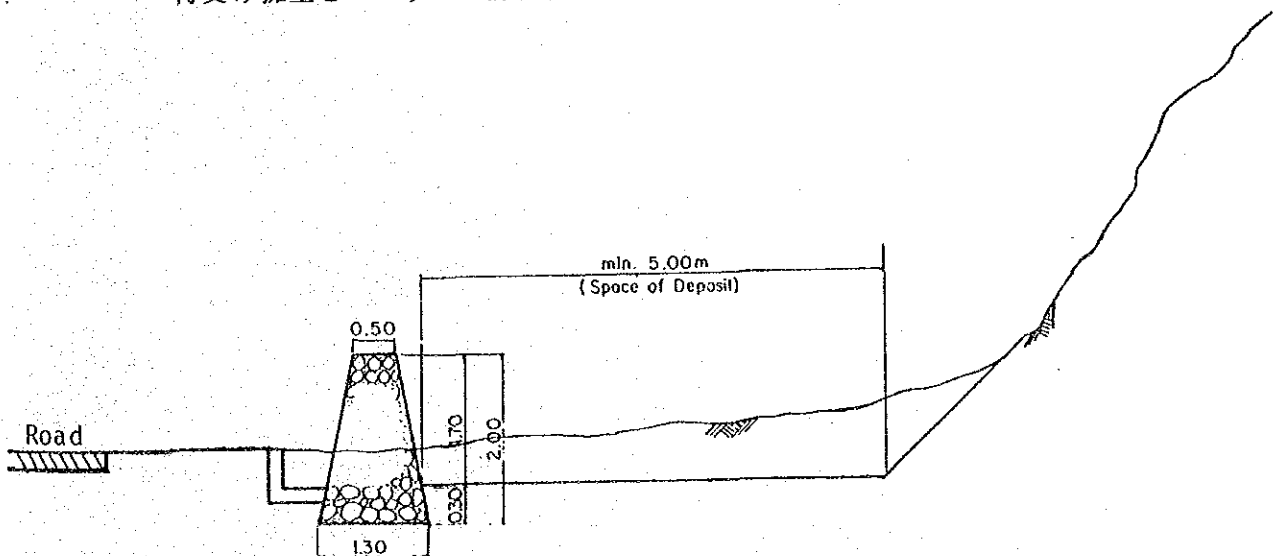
DETAIL OF CATCH WALL AND DEPOSIT SPACE
